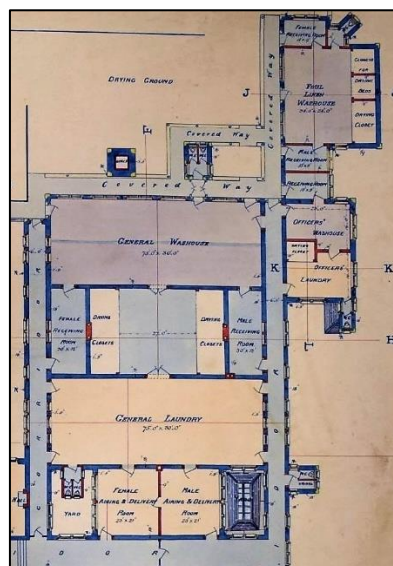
Ground Floor Plan of the new laundry, 1889 (Bristol Record Office ref. Bristol Plans/Arranged/41 [8265])
